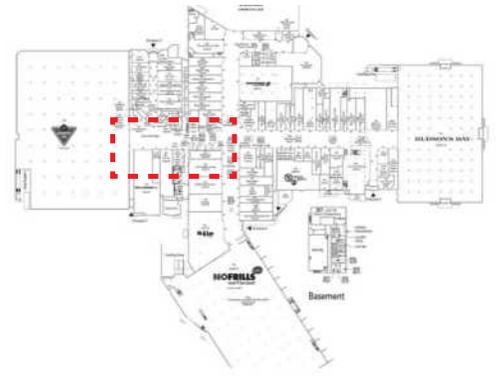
Enlarged proposed expansion and existing food court floor plan.
